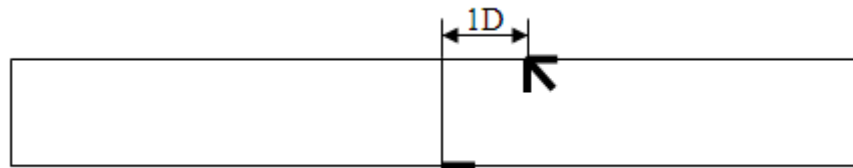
Strain gauge layout of single wall pipe or the outer pipe
